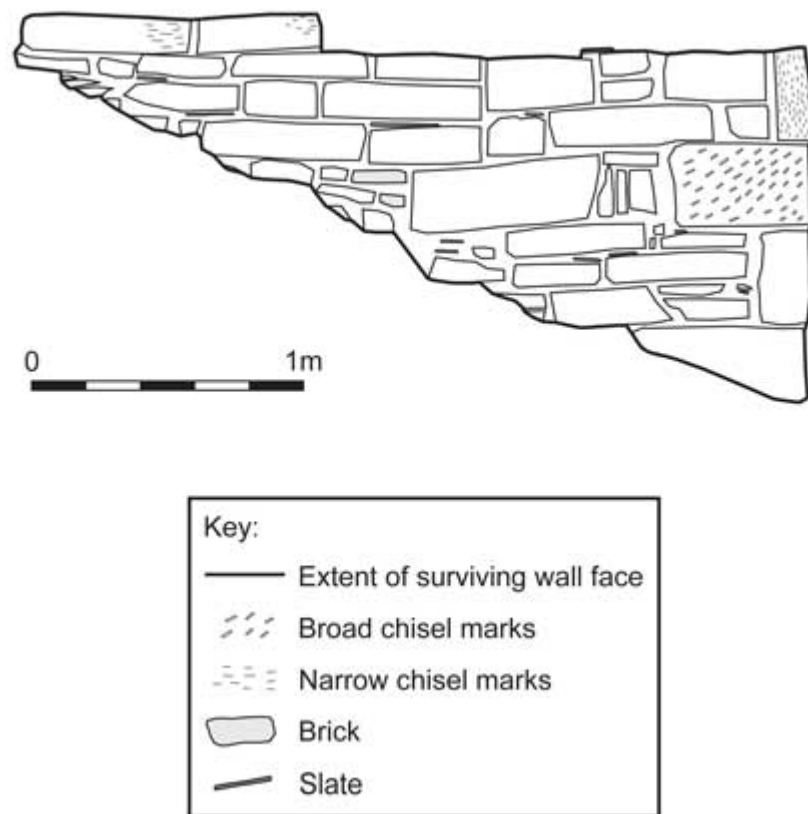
Structure 2, East Stair: Elevation a (West-facing Revetment)
